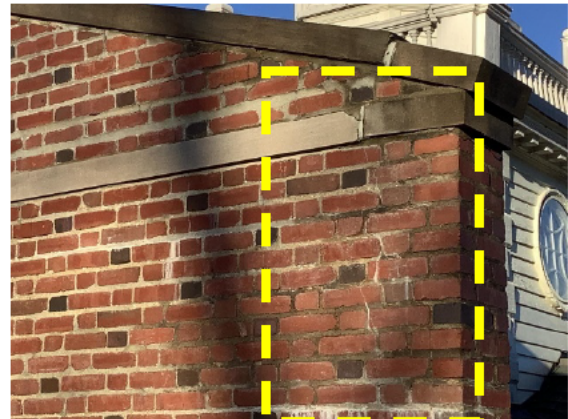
Step crack at end of pediment (dashed outline). Note the dropped cast stone at the right end of the horizontal band.
